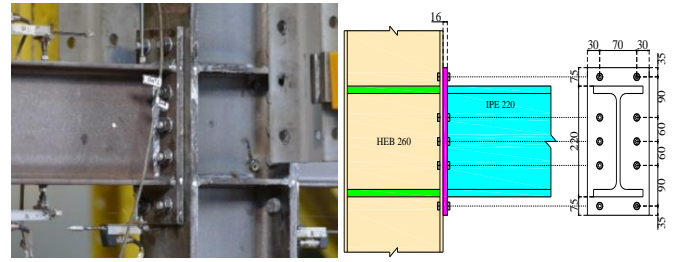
Photos of specimen EP before the test and geometrical details used by [21]
